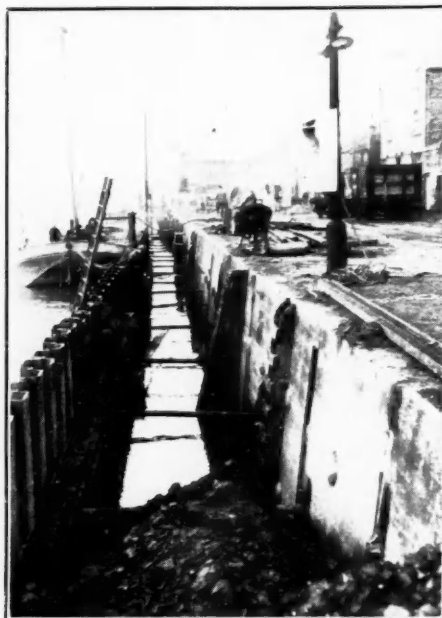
View looking north during construction, showing Larssen piling and tie bars.
